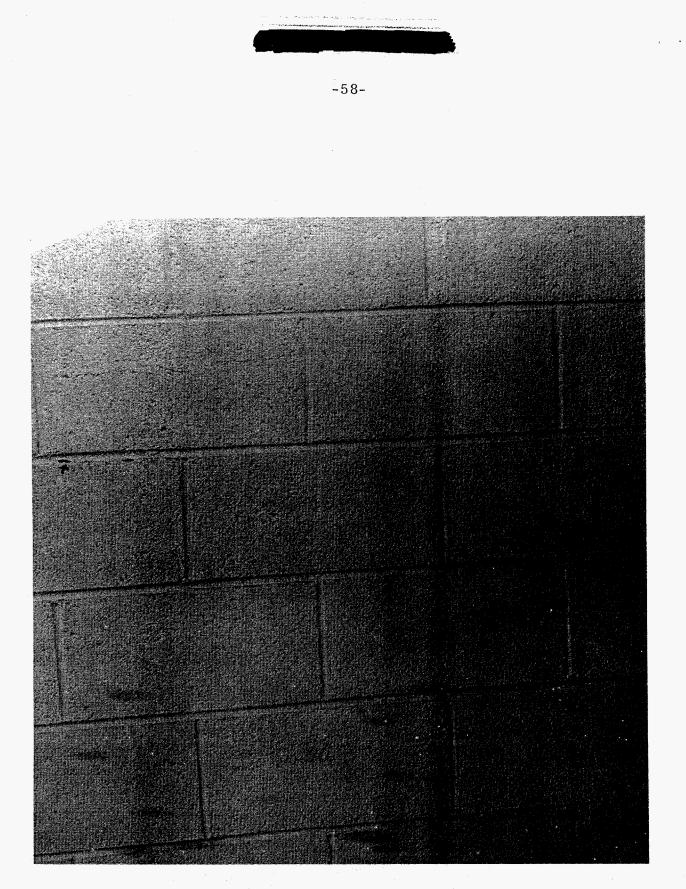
Building 681, west end, $0.18\;\mathrm{cm/sec.}$
